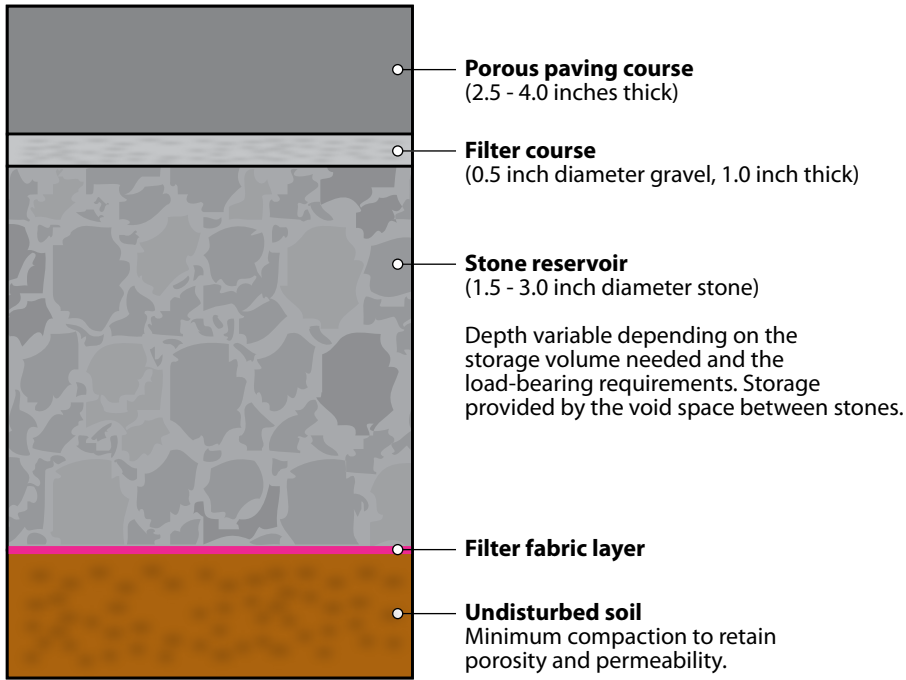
Typical cross-section of permeable pavement. Adapted from City of Rockville, MD (1992).
